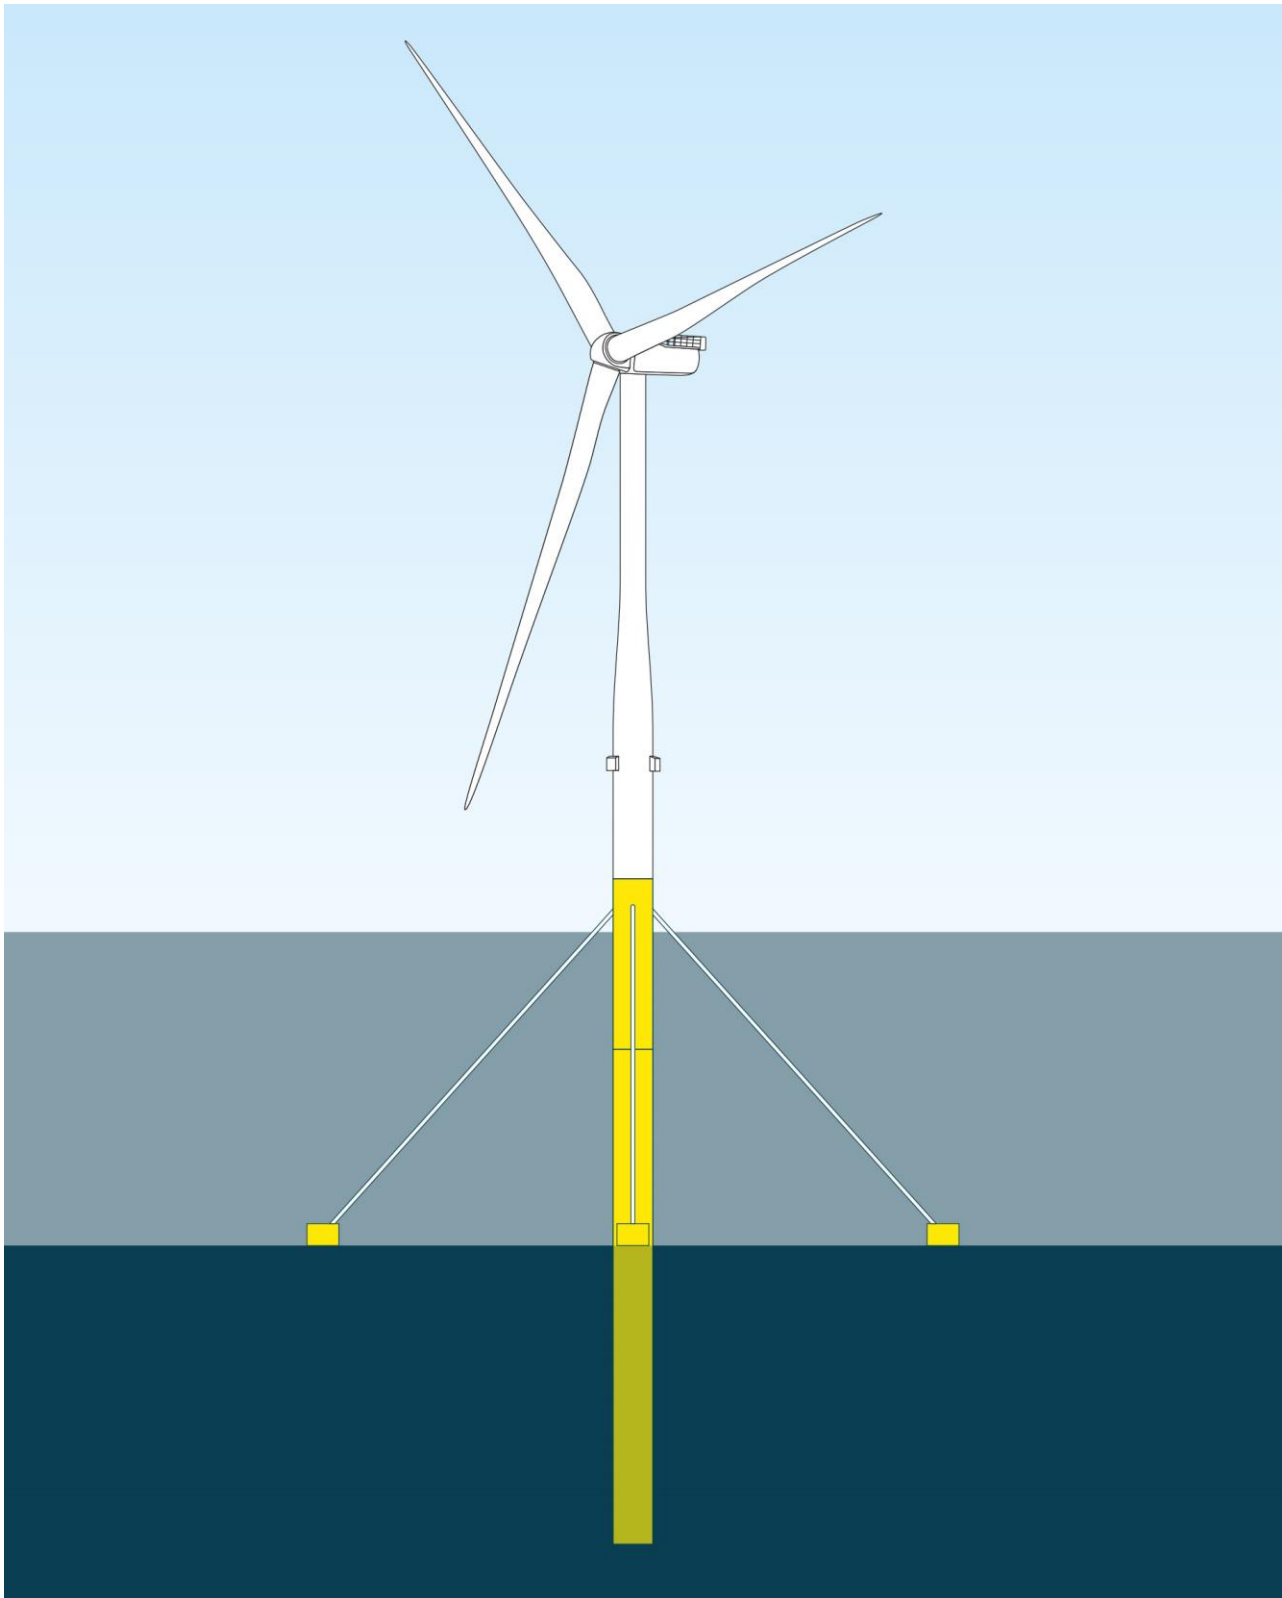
Indicative design of a fully restrained platform (FRP) WTG foundation.
